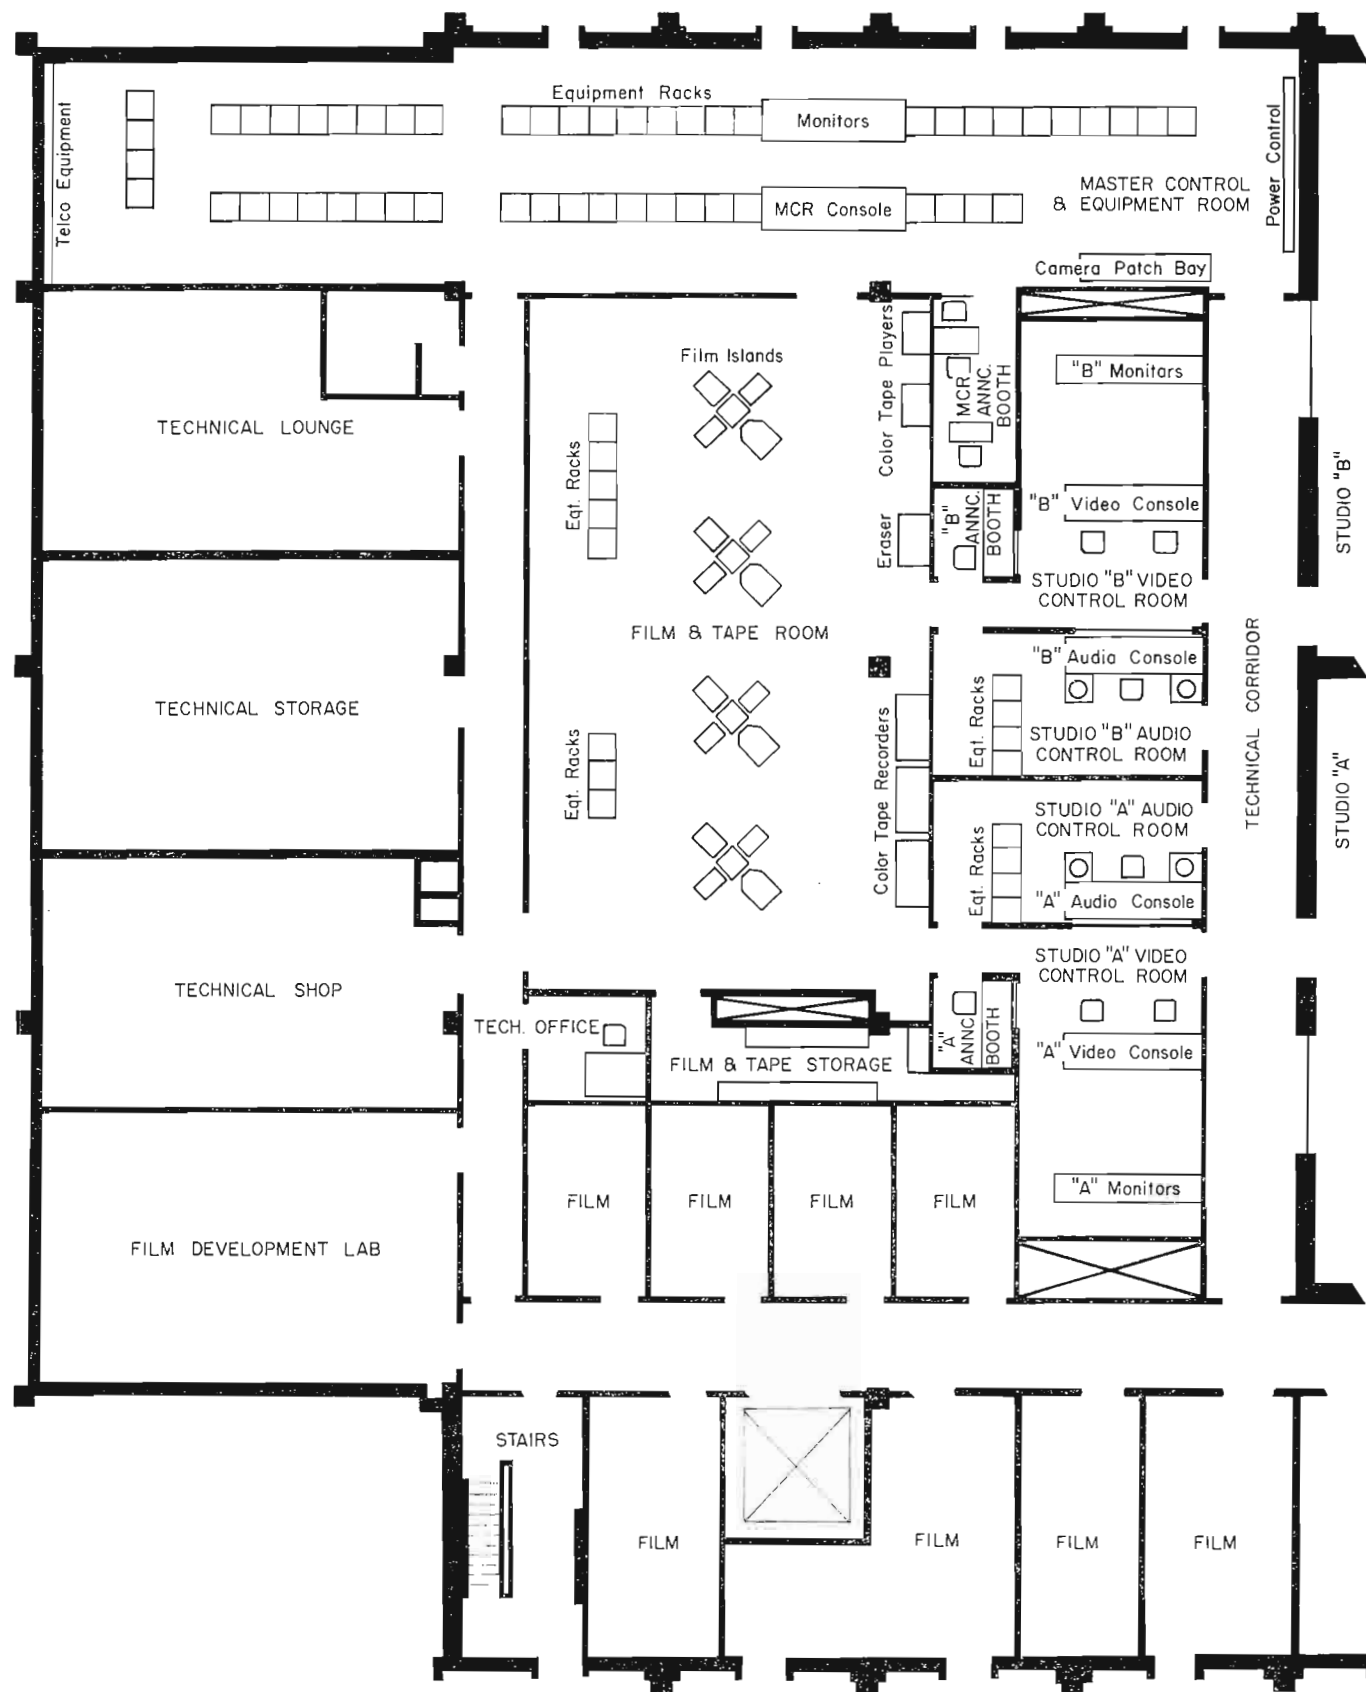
Floor plan of the technical area of the new KRON-TV Building.
